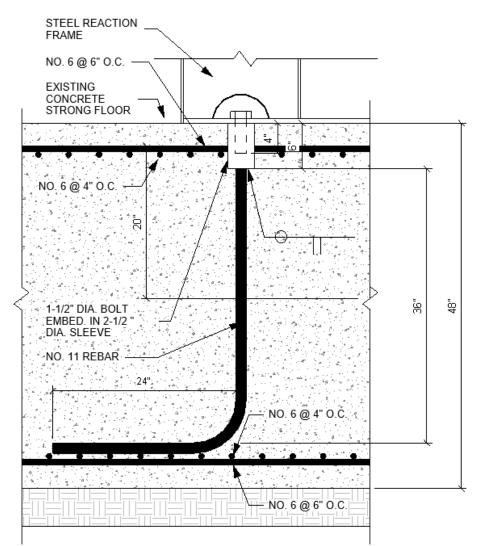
Detail of Steel Reaction Frame to Strong Floor Connection
